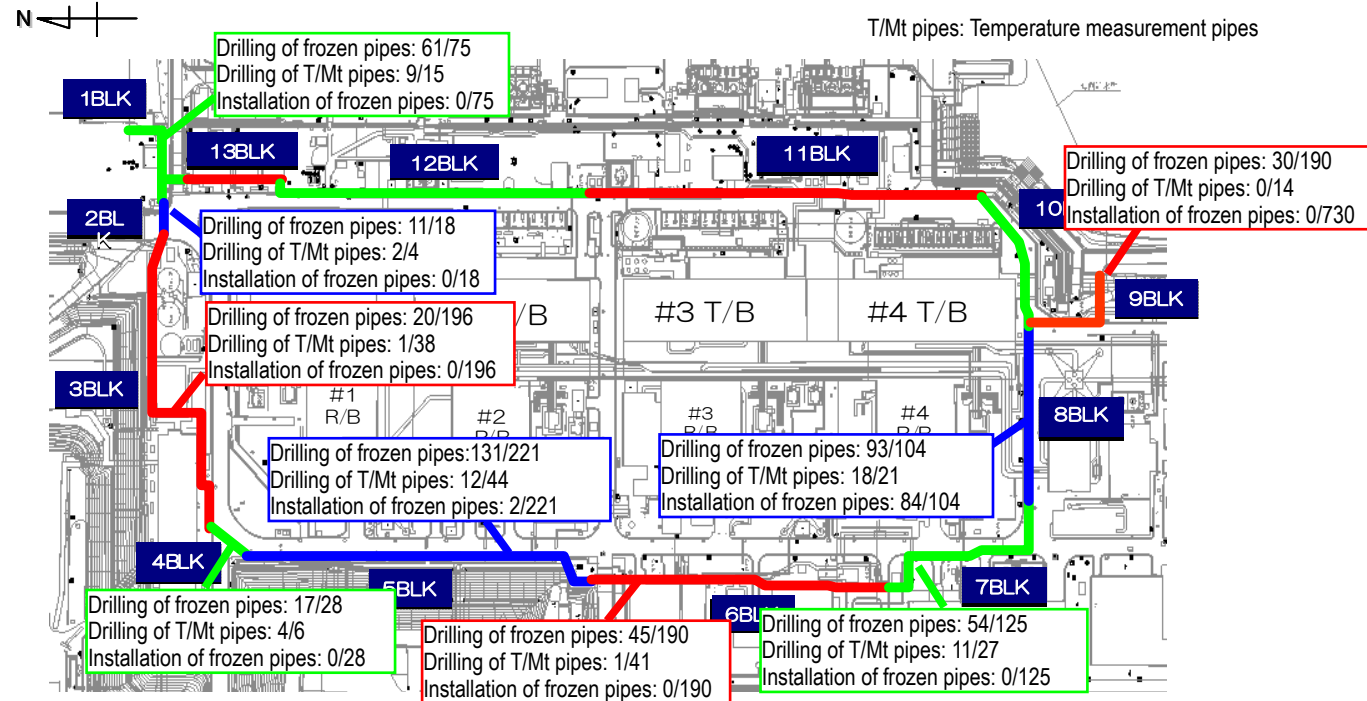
Status of drilling for frozen-soil impermeable walls and installation of frozen pipes
